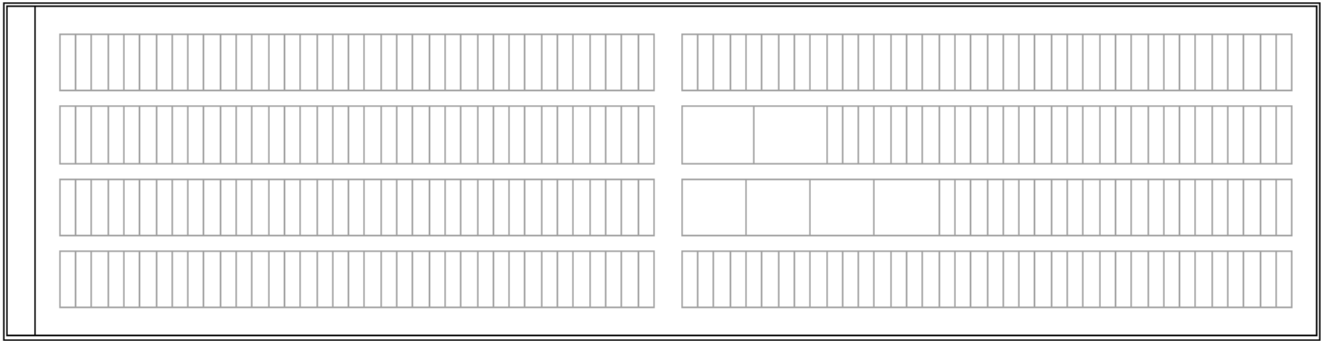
Prototypical Gestation Stall Barn, Stalls 7' x 2'. Aisles 4 feet.
